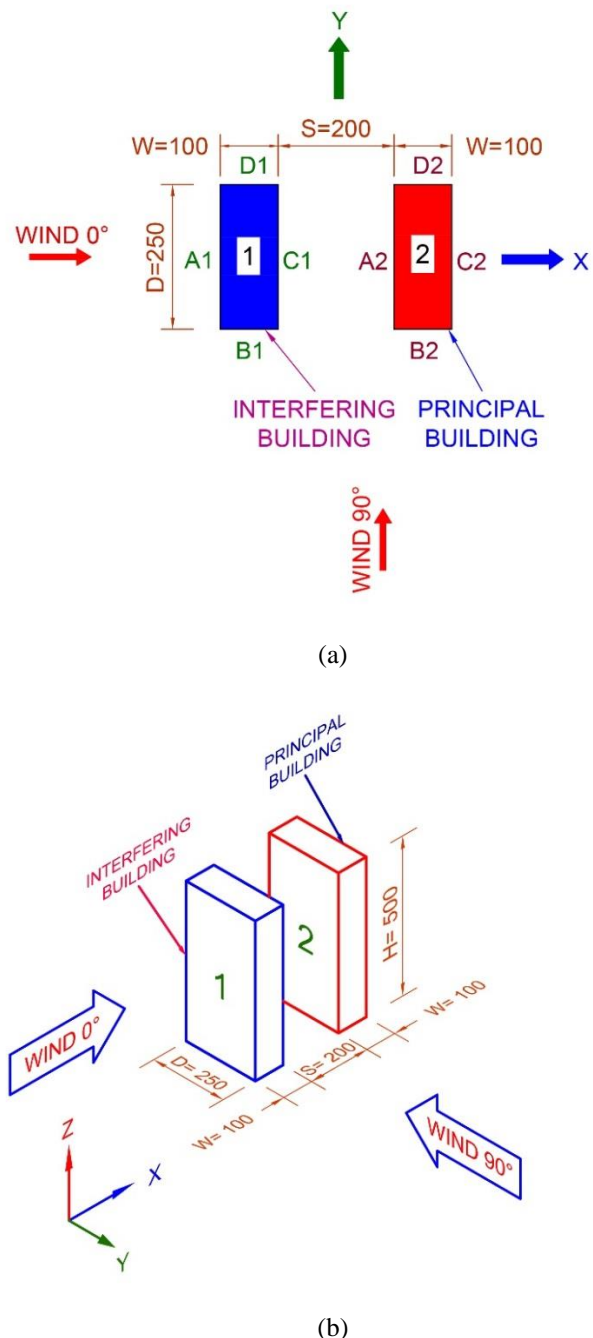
Details dimension and attacking wind angle of interfering and principal building (a) Plan view (b) Isometric view.
